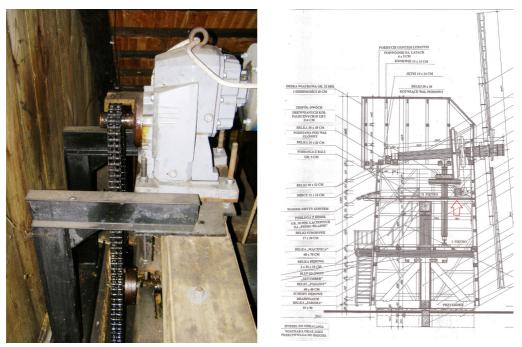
An electric motor with a gear motor in a windmill from Grzawa; photo by F. Tomaszewski, August 2022.
